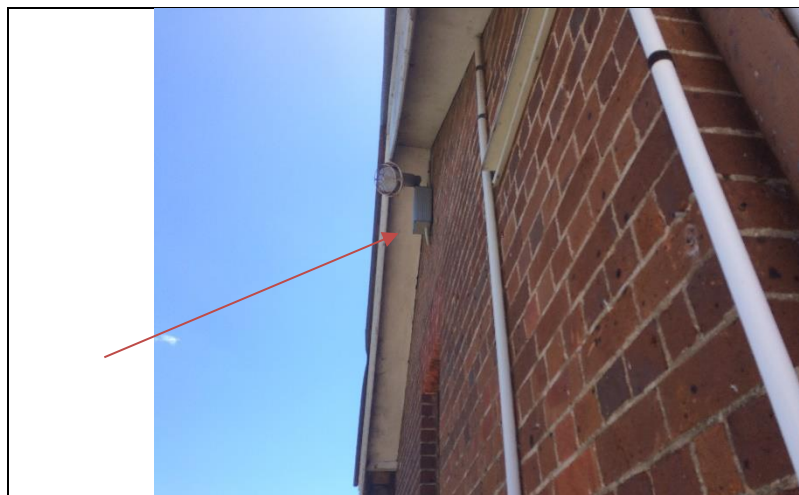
Highway Patrol Office – External; Eaves, north and south – Suspect asbestos cement lining (A4)
